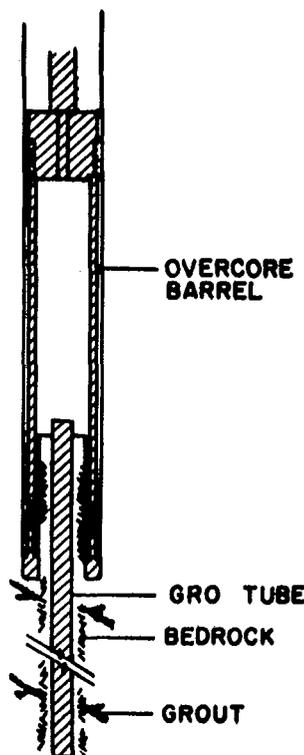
ISM Phase III, overcoring grout reinforced "GRO" tube.
